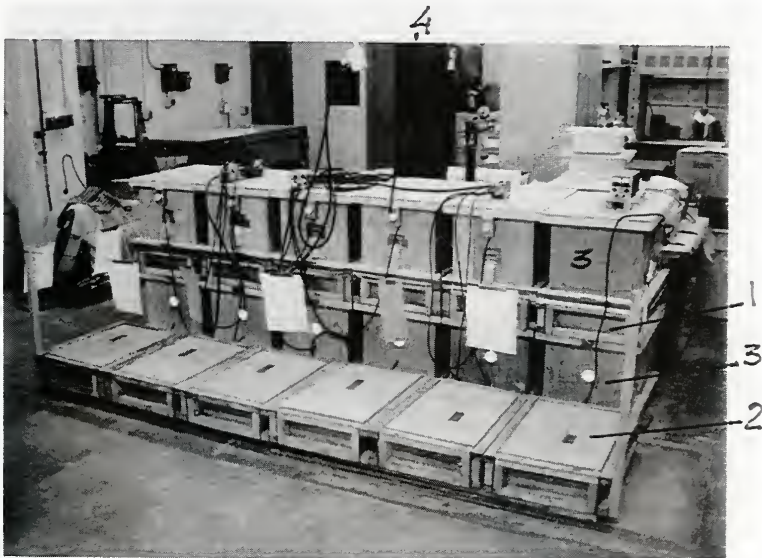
Conditioning of concrete slab specimens in the concrete lab (Purdue Civil Engineering Building):
